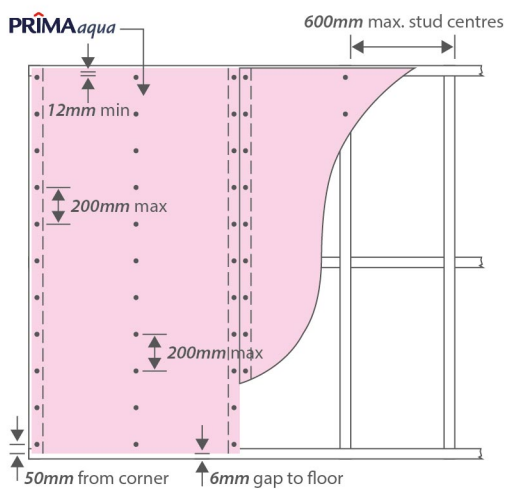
Vertical Sheet Fixing (Untiled Wall)
